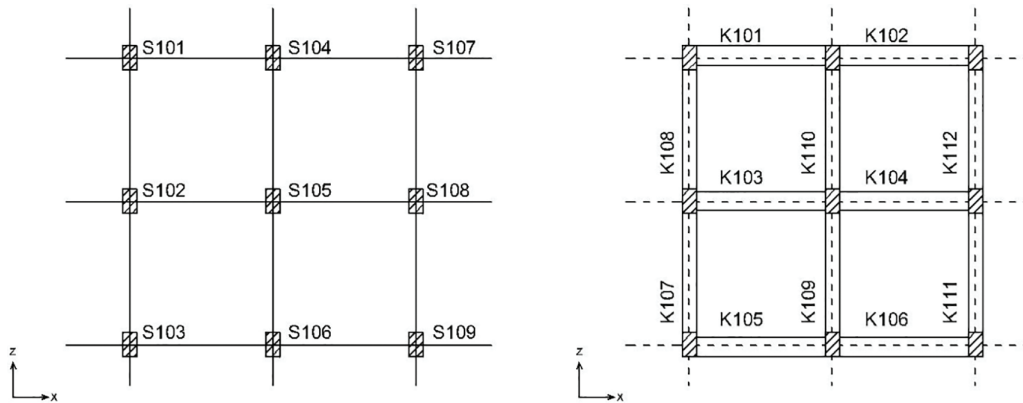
Load distribution and cross-section view of the 2-storey 2-span structure
